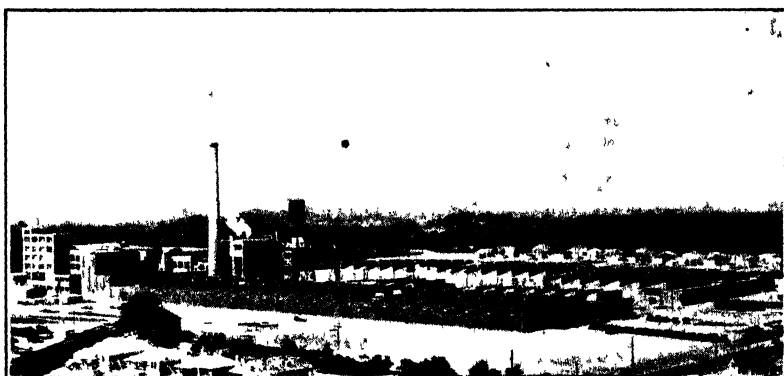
Single-story building with saw-tooth roof construction, erected for The American Chatillon Corporation, manufacturers of Rayon. (Courtesy of Lockwood Greene Engineers, Inc.)
